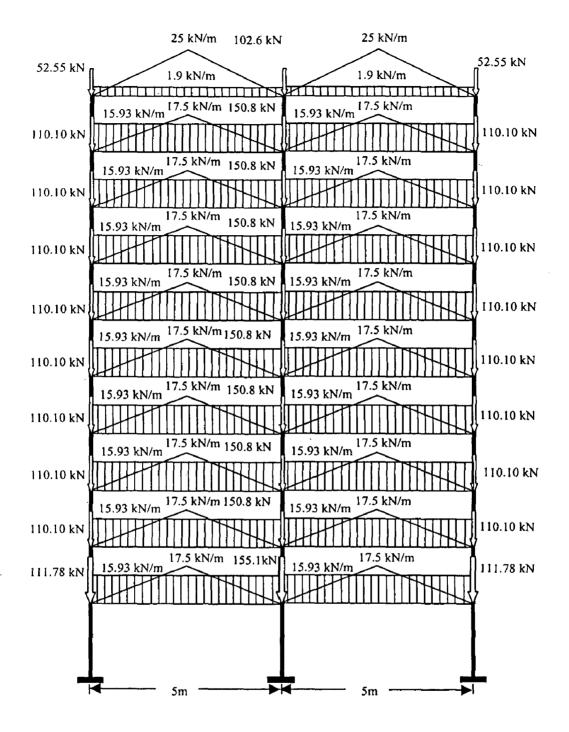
Dead load details on G+10 storeyed two-bay plane frame with open storey
